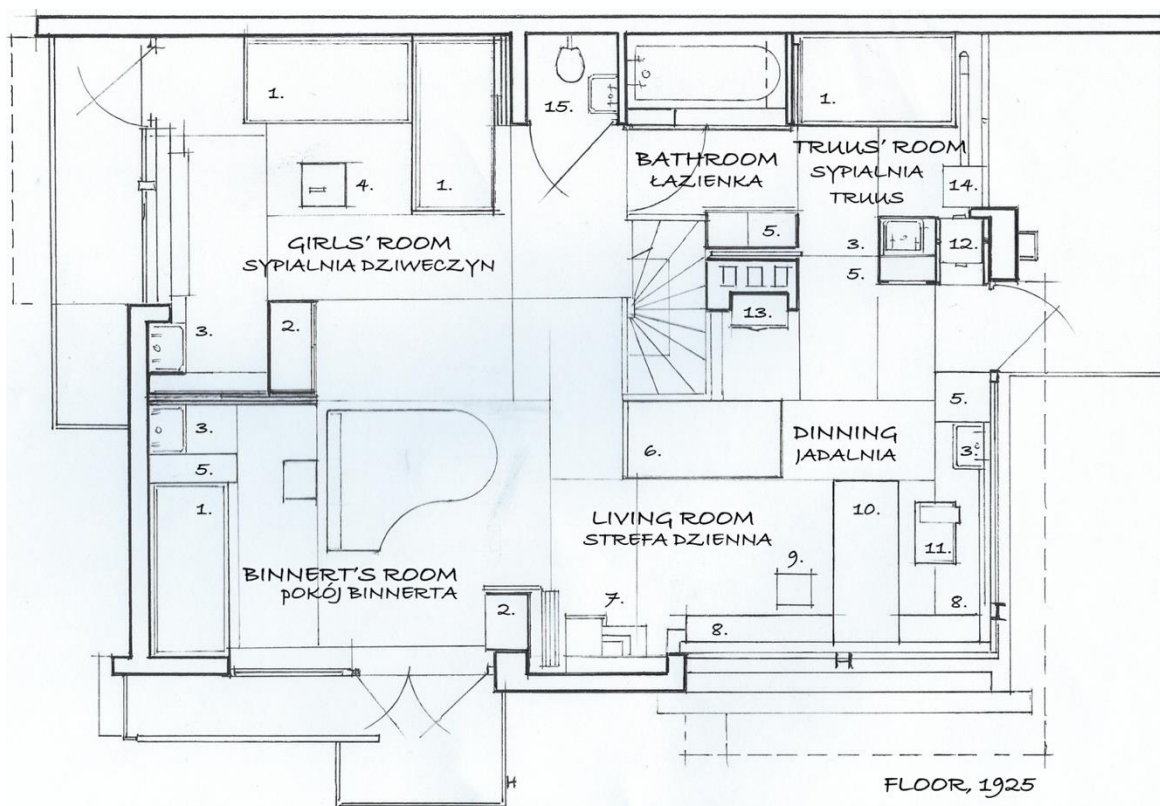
Rietveld-Schröder House first floor plan, as of 1925. Source: by author based on (Garcia-Salgado, 2018) and Centraal Museum photographs. (Legend: 1. bed, 2. wardrobe, 3. washbasin, 4. berlin table, 5. cabinet, 6. couch, 7. "yellow piece of furniture", 8. blue desks, 9. military stool, 10. military table, 11. berlin chairs, 12. lift "dumbwaiter", 13. stove, 14. shelf).
